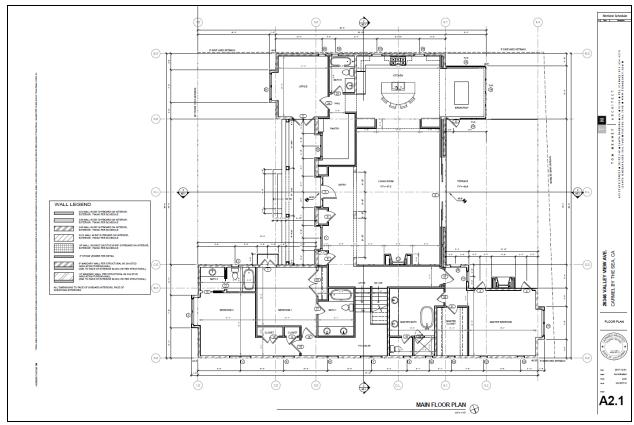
Main Floor Plan: Proposed floor plans for the new two-level single family dwelling at 26346 Valley View Avenue.
